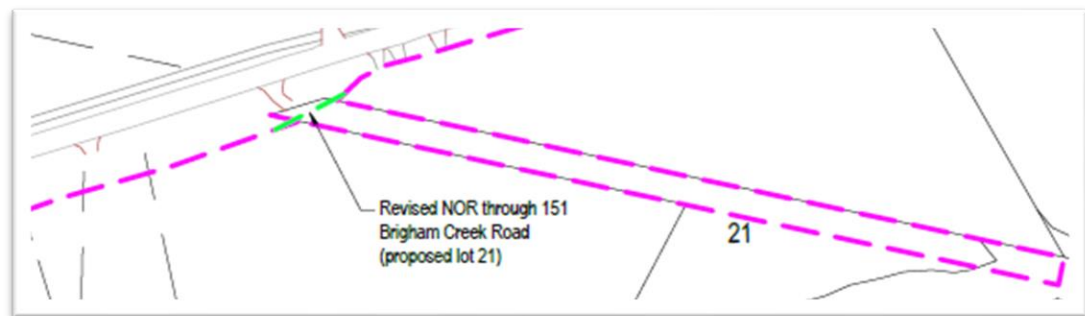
Requested amendment to extent of proposed designation – 151 Brigham Creek Road
